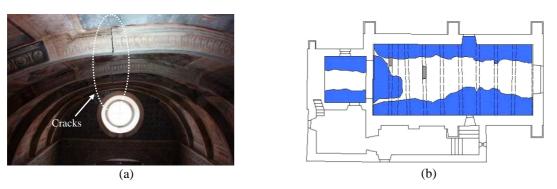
Damage: (a) cracks at the arches of the vault; (b) damp patches.
